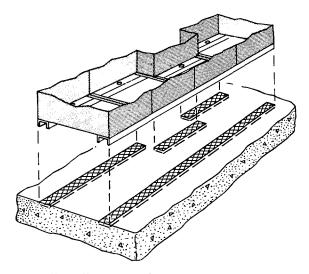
Installing steel floor members (Note front lineup of 13-in. (330.2 mm) deep section)
